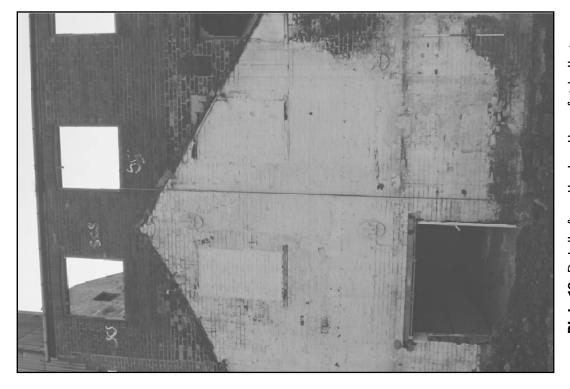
General view of grinding workshop, looking southeast (film 9.30)
